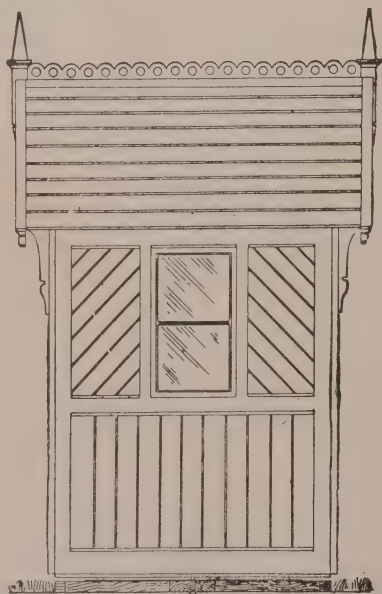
Side Elevation of Portable Revolving Summerhouse
